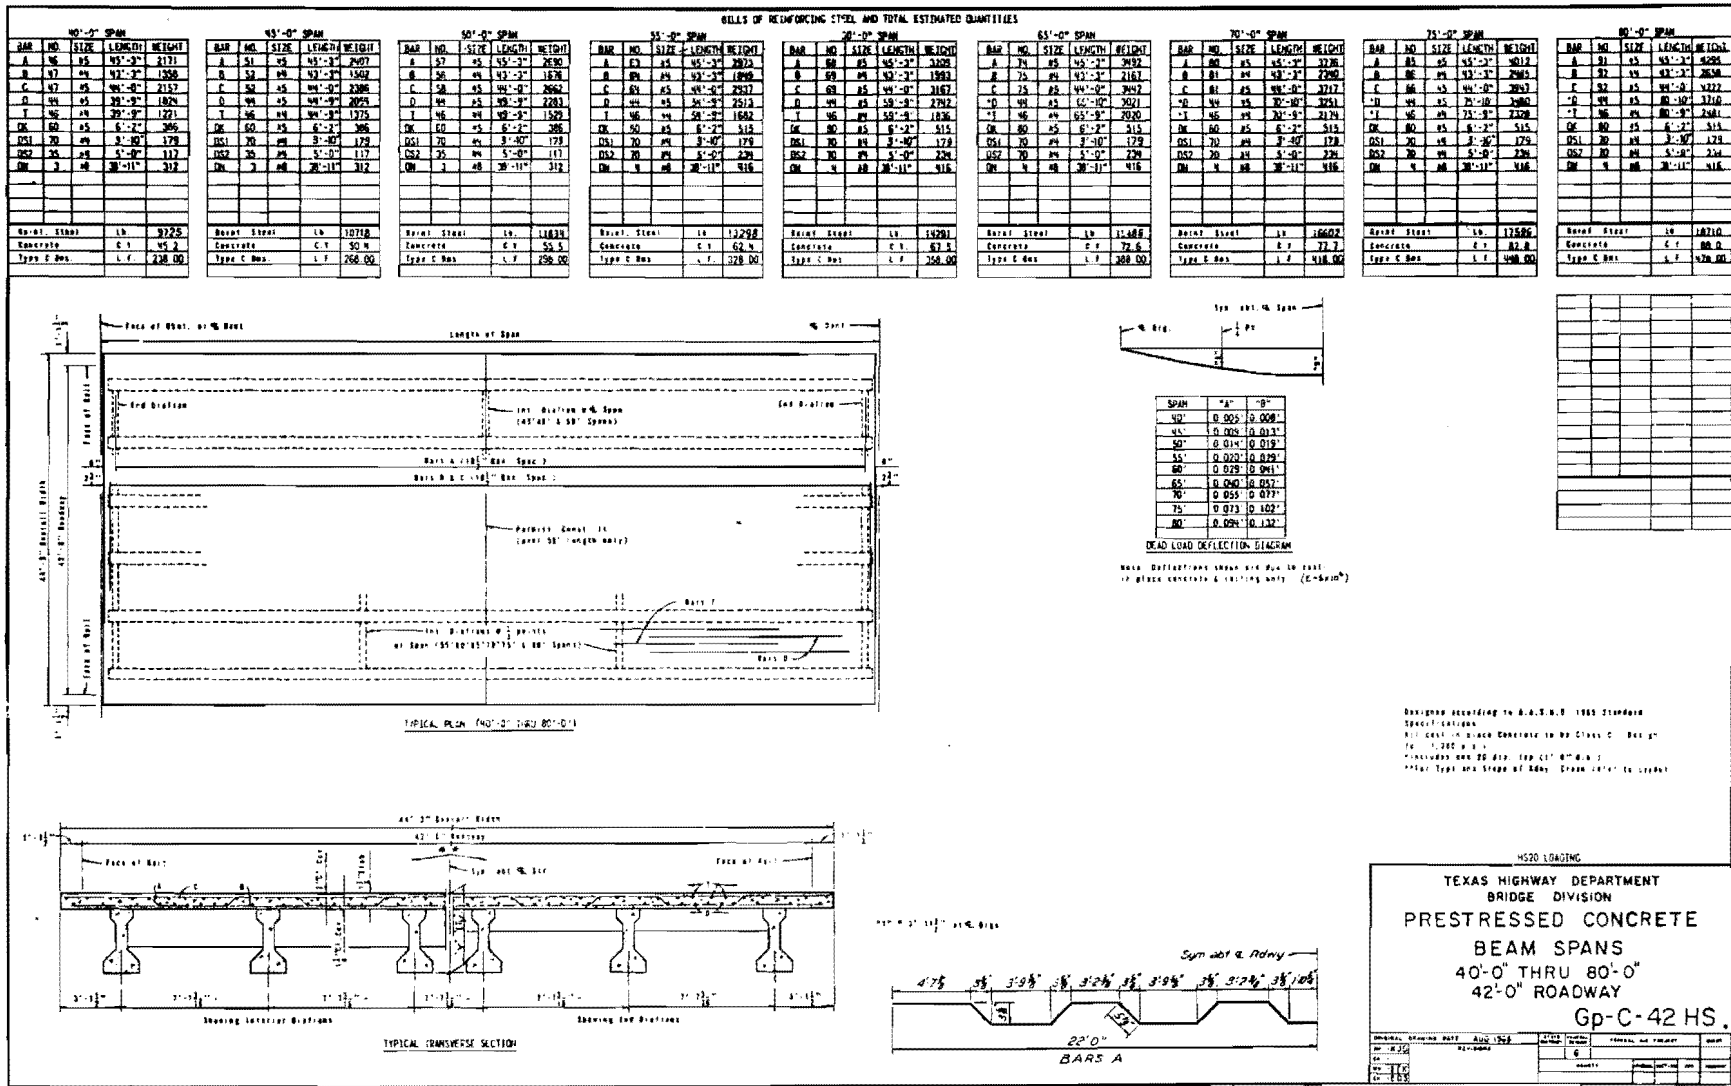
PROTOTYPE PLAN FOR BRIDGE 3 (80 FT. SPAN) AND BRIDGE 4 (50 FT. SPAN)
